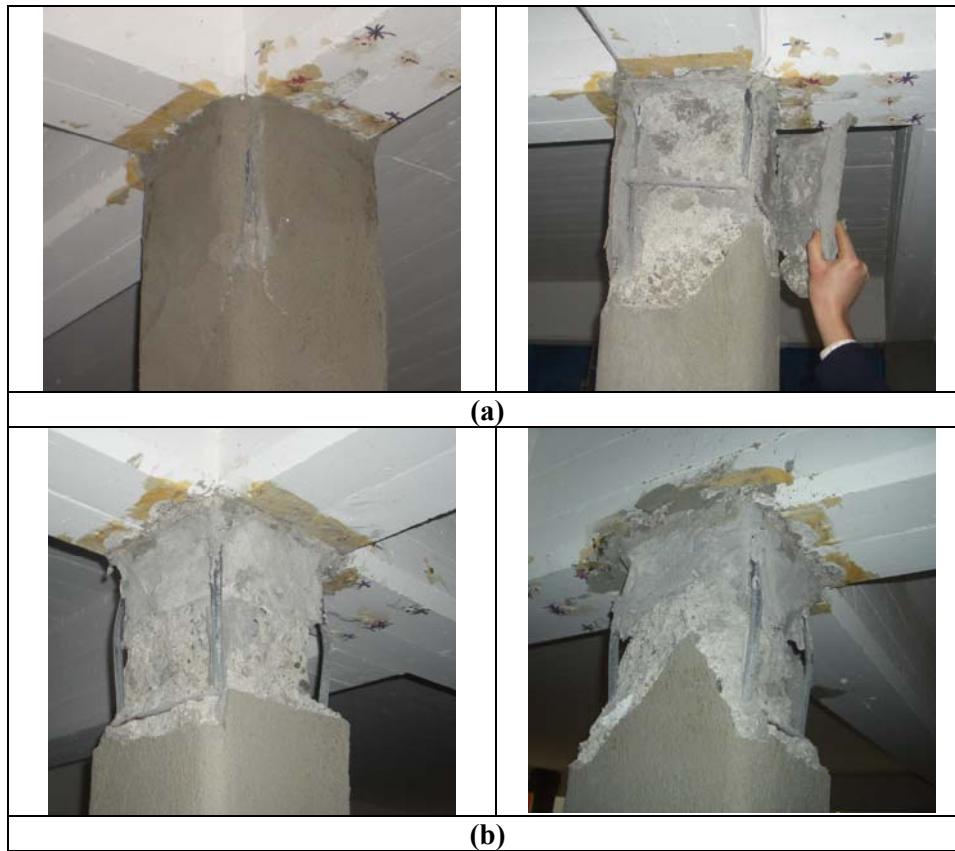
Damages on the central column C3 at 1st (a) and 2nd storey (b)
